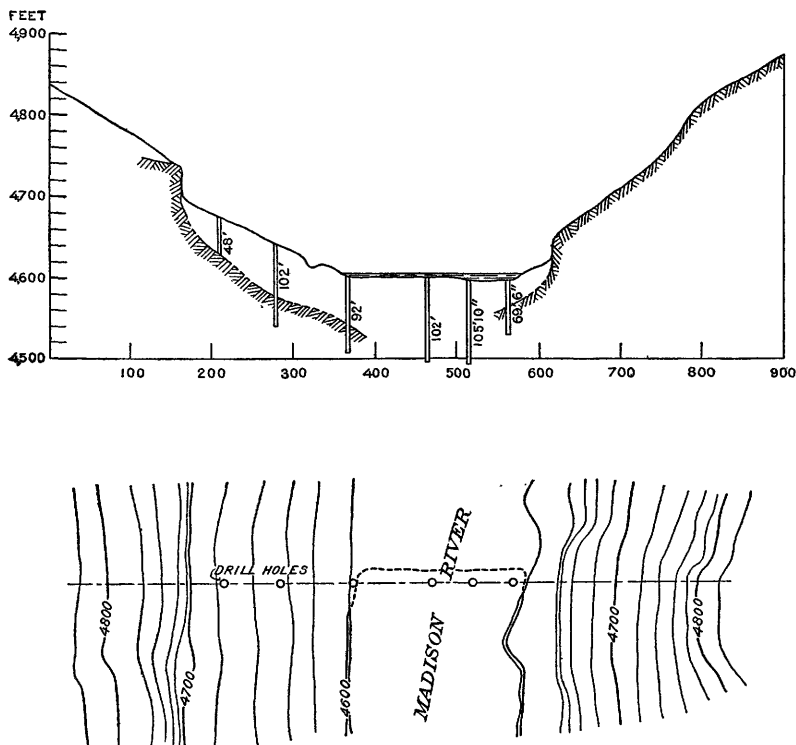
Cross section of Madison River in lower canyon section, showing drill holes made by Montana Power Co.
